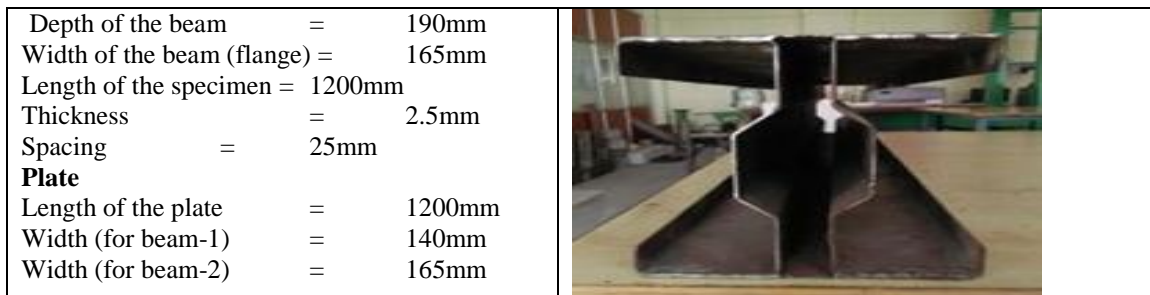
Sectional specifications of beam corrugated horizontally back-to-back with a spacing of 25mm
